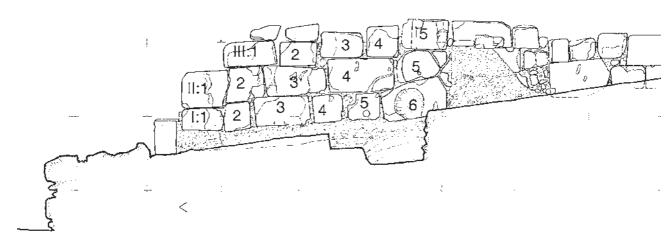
South elevation of wall L1 (Section T15 = Pl. 31). Drawing by B. Blomé, A. Bizzarro and G. Tilia.
